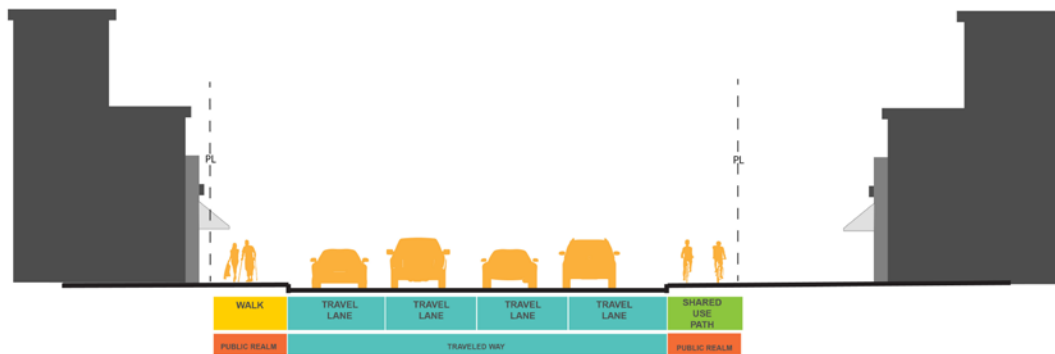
Illustration of future typical cross section of 50 Avenue and 53 Avenue east of Main Street following implementation of the OTCP and roadway hierarchy.
